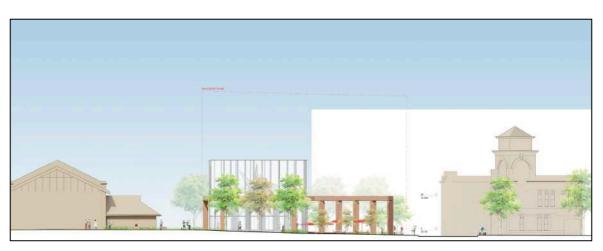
East elevation (courtyard) Source: JRP and MAKO Architects
